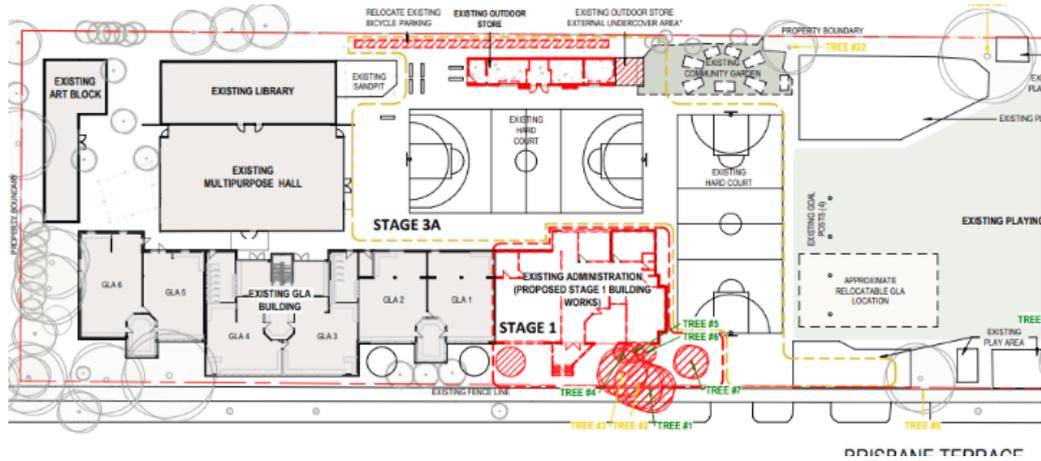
Demolition Site Plan (Source: Proposed development plans)
